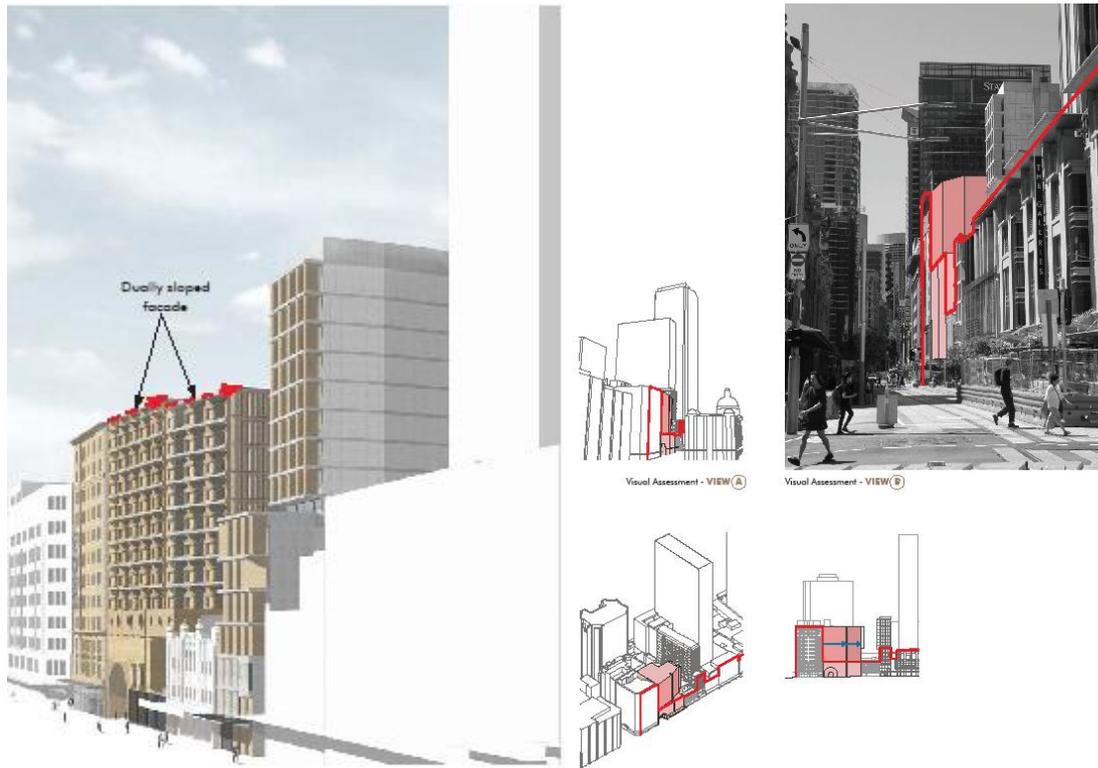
Extract from 'Facade Design Development Report (Candalepas Associates), showing an option matching the Gowings building height, indicating a dually sloped facade
